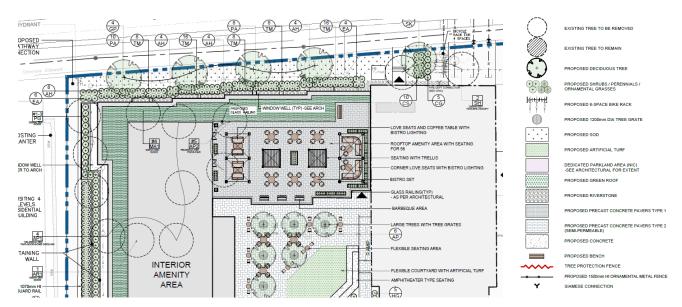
Extract of the Landscape Plan, highlighting the proposed landscaping along Oblats Avenue
